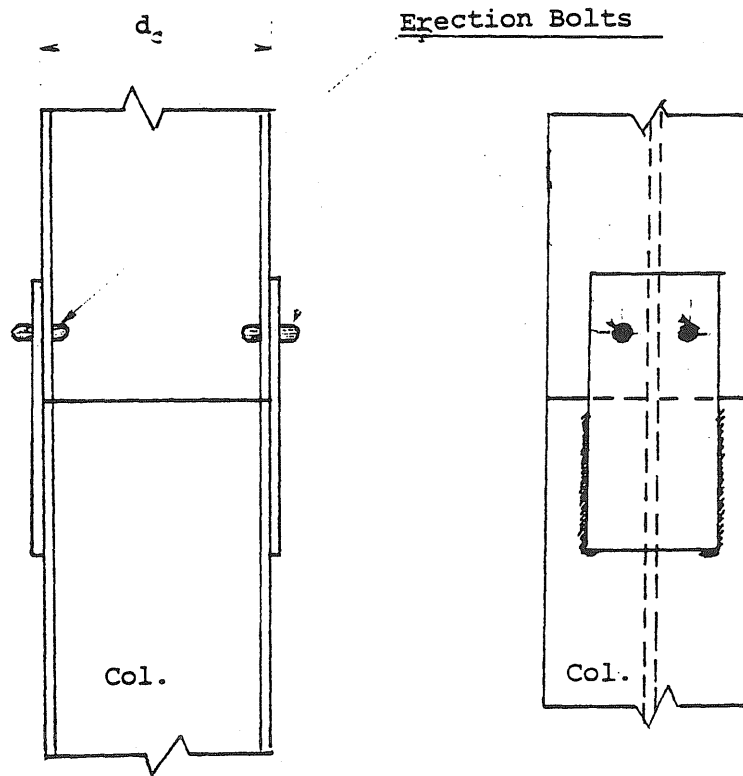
A Welded Column Splice at Temporary Stage
